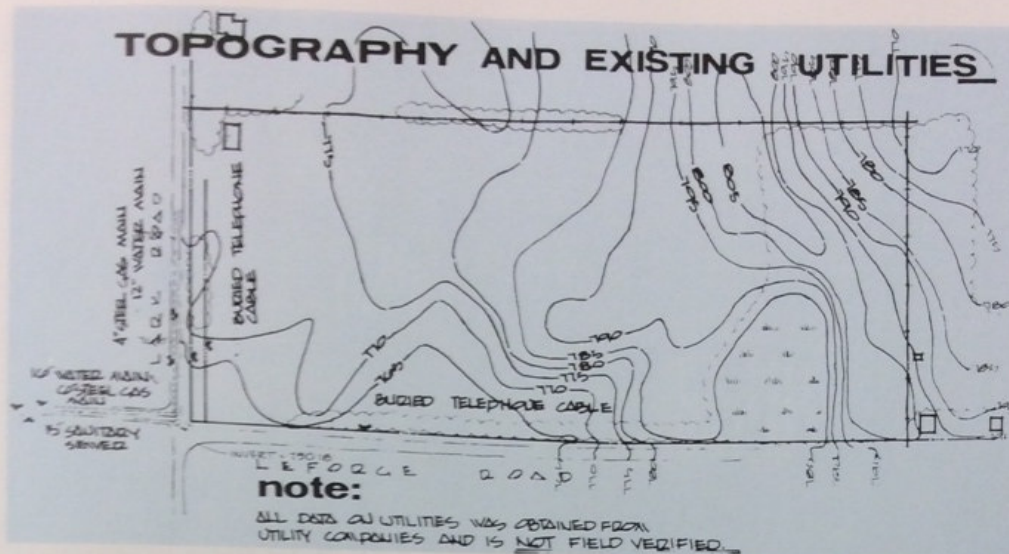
A site plan which shows topographical features such as contour, elevations, trees, and property lines. (Midwestern Consulting, Inc.)
